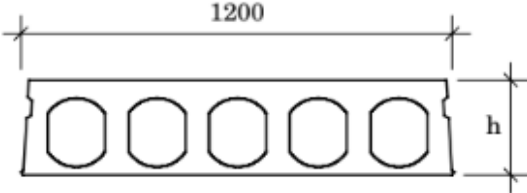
Rendering of a standard concrete floor element. Source: Vinje, Wilberg and Alexander (2010)
